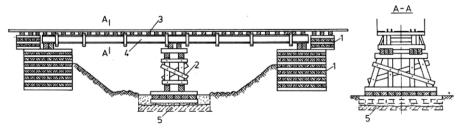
Provisional bridge reconstruction (Cholewo & Sznurowski, 1970; Miklin & Sawicki, 1993): 1 – railway sleeper cages forming the bridge abutments, 2 – provisional support in the form of a wooden yoke, 3 – railway pavement, 4 – provisional span, 5 – substructure of the intermediate support in place of the destroyed pillar of the fixed bridge
